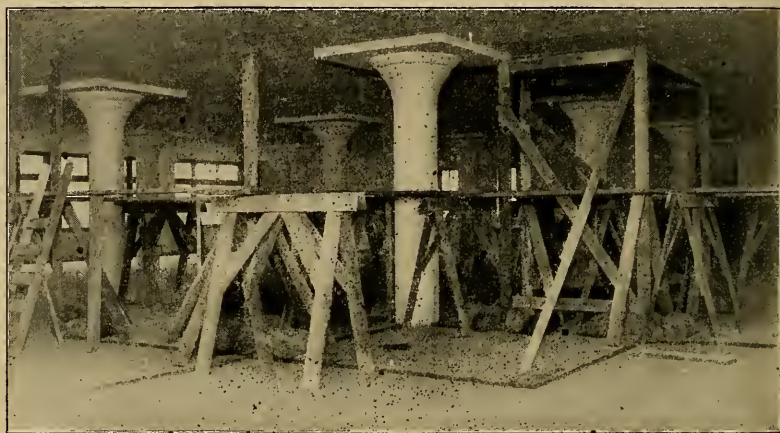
FRANKS BUILDING TEST; OBSERVATION PLATFORM AND DEFLECTION FRAMEWORK.
